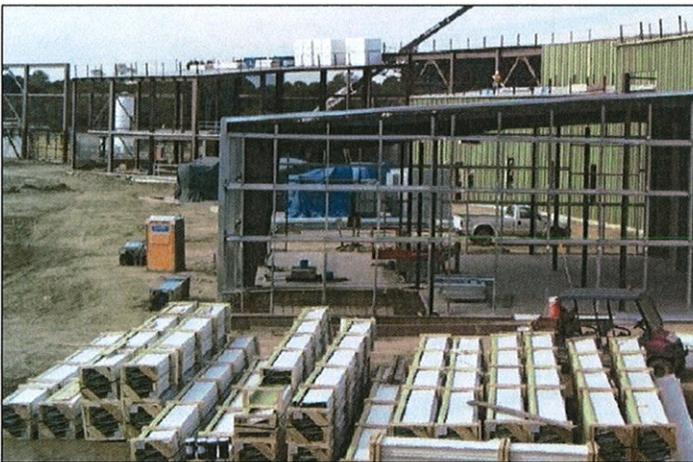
Compressor building framing, staging for building wall panels, and RF building exterior skin (green) in the background.
